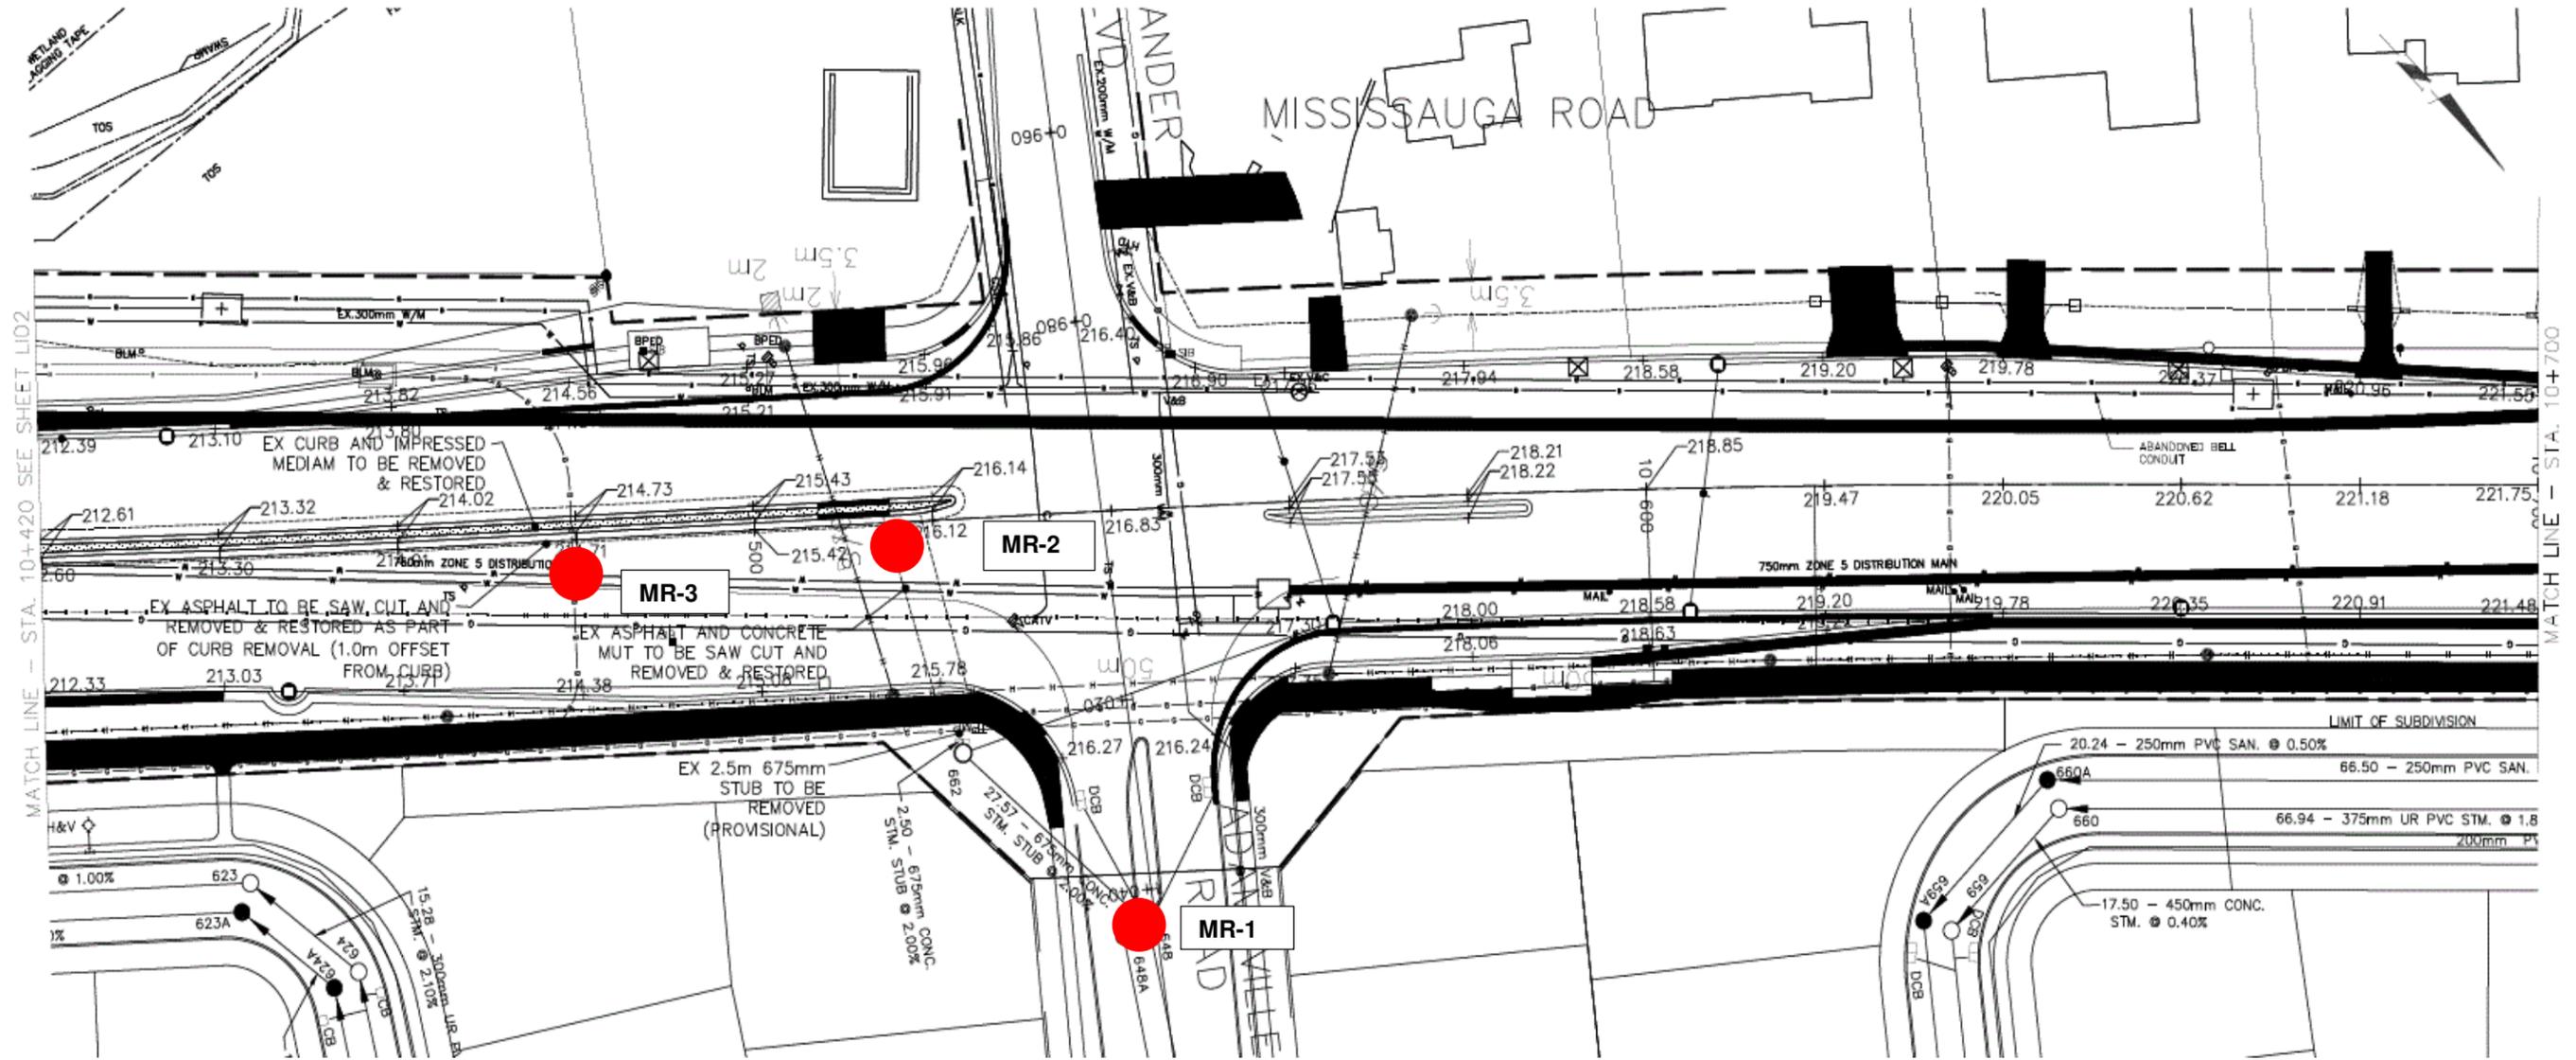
Mississauga Road Design Drawing and Monitoring Locations
